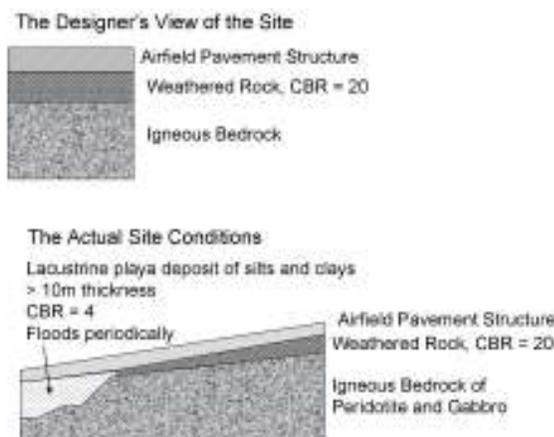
Contrast Between Designer's Concept of Site and Actual Site Conditions.
